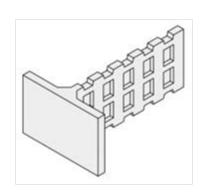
Modular Block Wall Example (T-WALL®) (source: The Neel Company)
